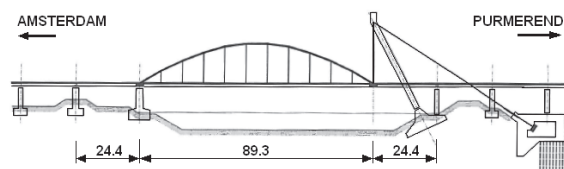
Intended navigation width extension of the Amsterdam Bridge
